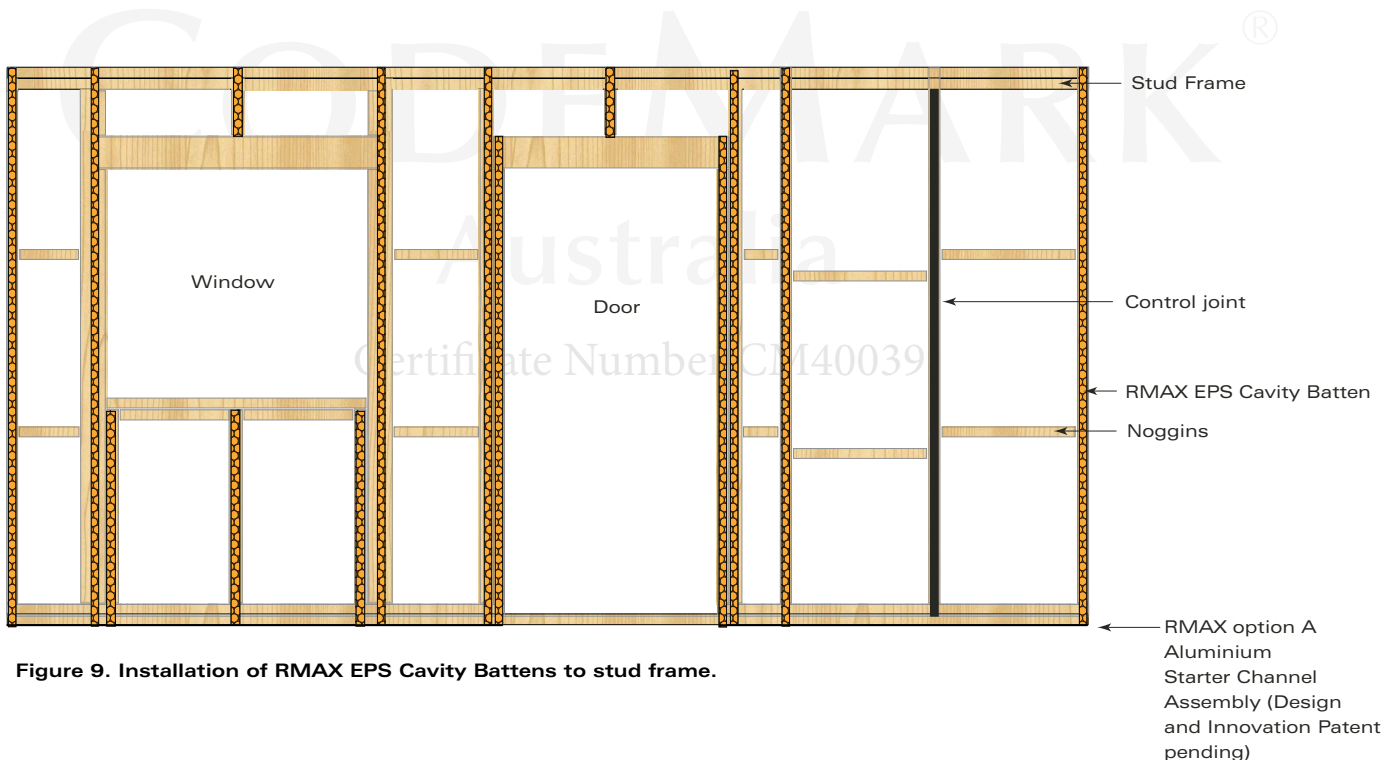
Installation of RMAX EPS Cavity Battens to stud frame.
